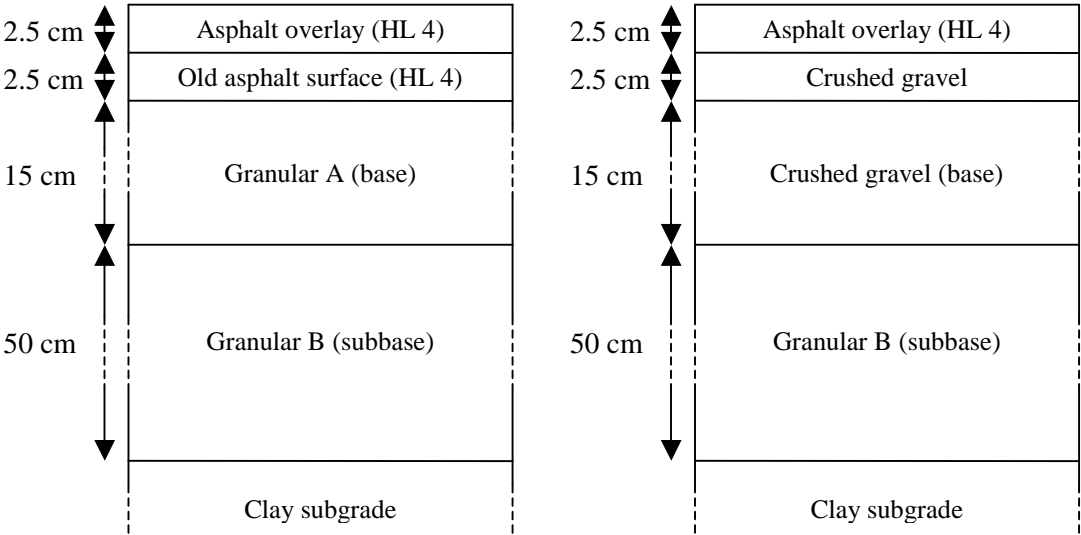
Typical Pavement Structures used in the MEPDG Analysis (left: “asphalt road”; right: “gravel road”)
